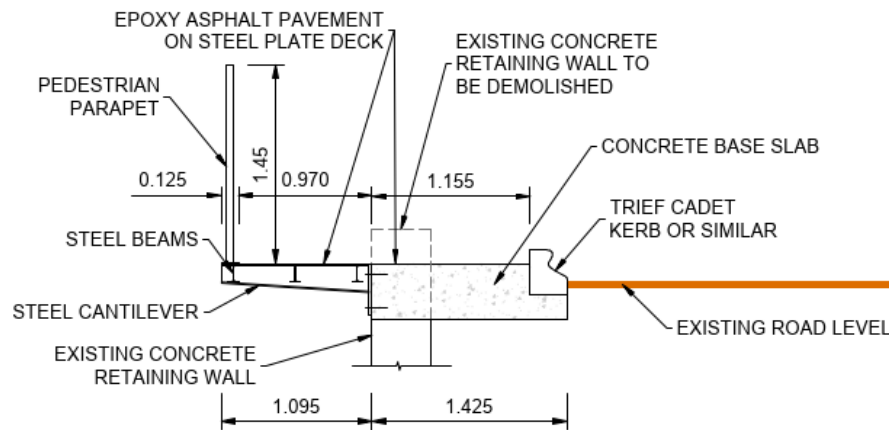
Kimmage 04 – Typical Cross Section of structural ramp
